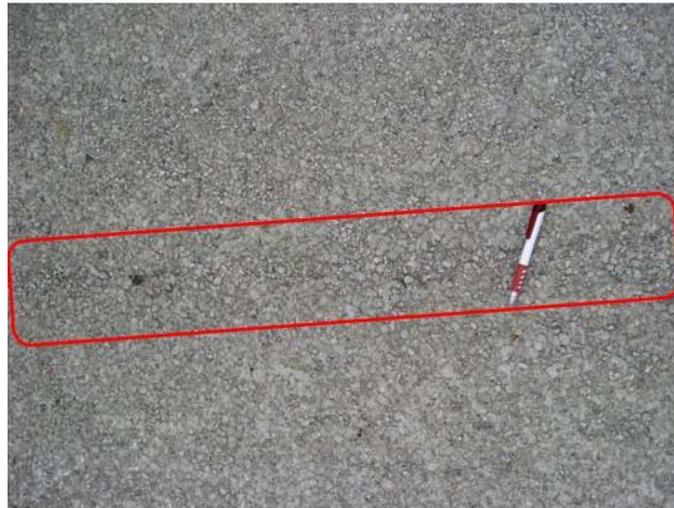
Formed Joint April 2011 (46 Months) Site 1
